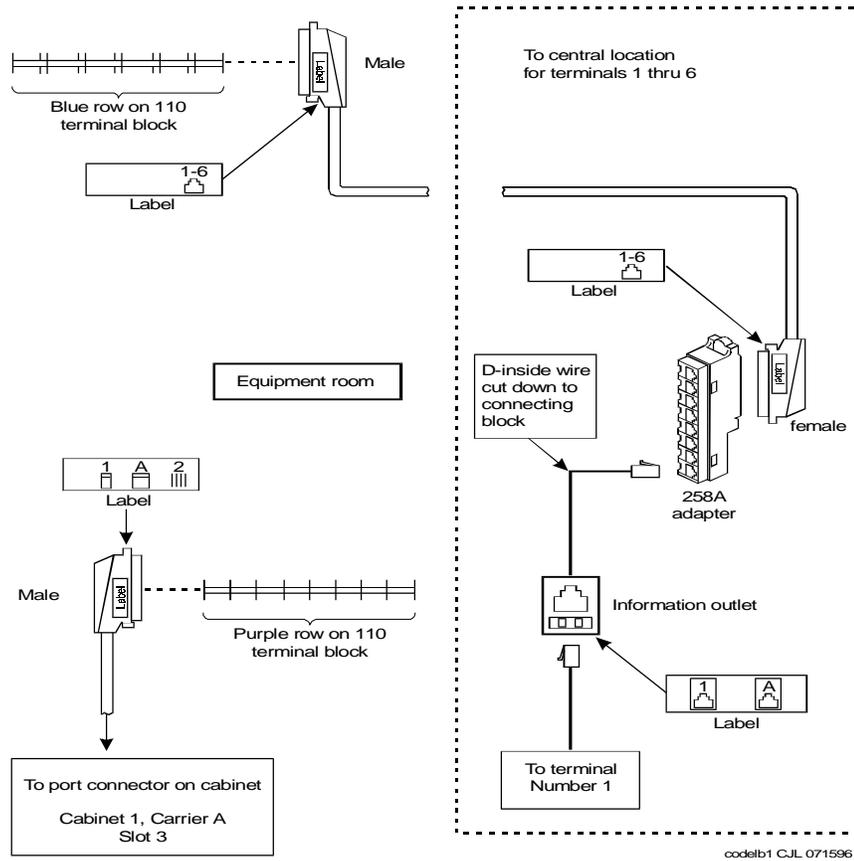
Example 4-Pair Labeling to Information Outlet
